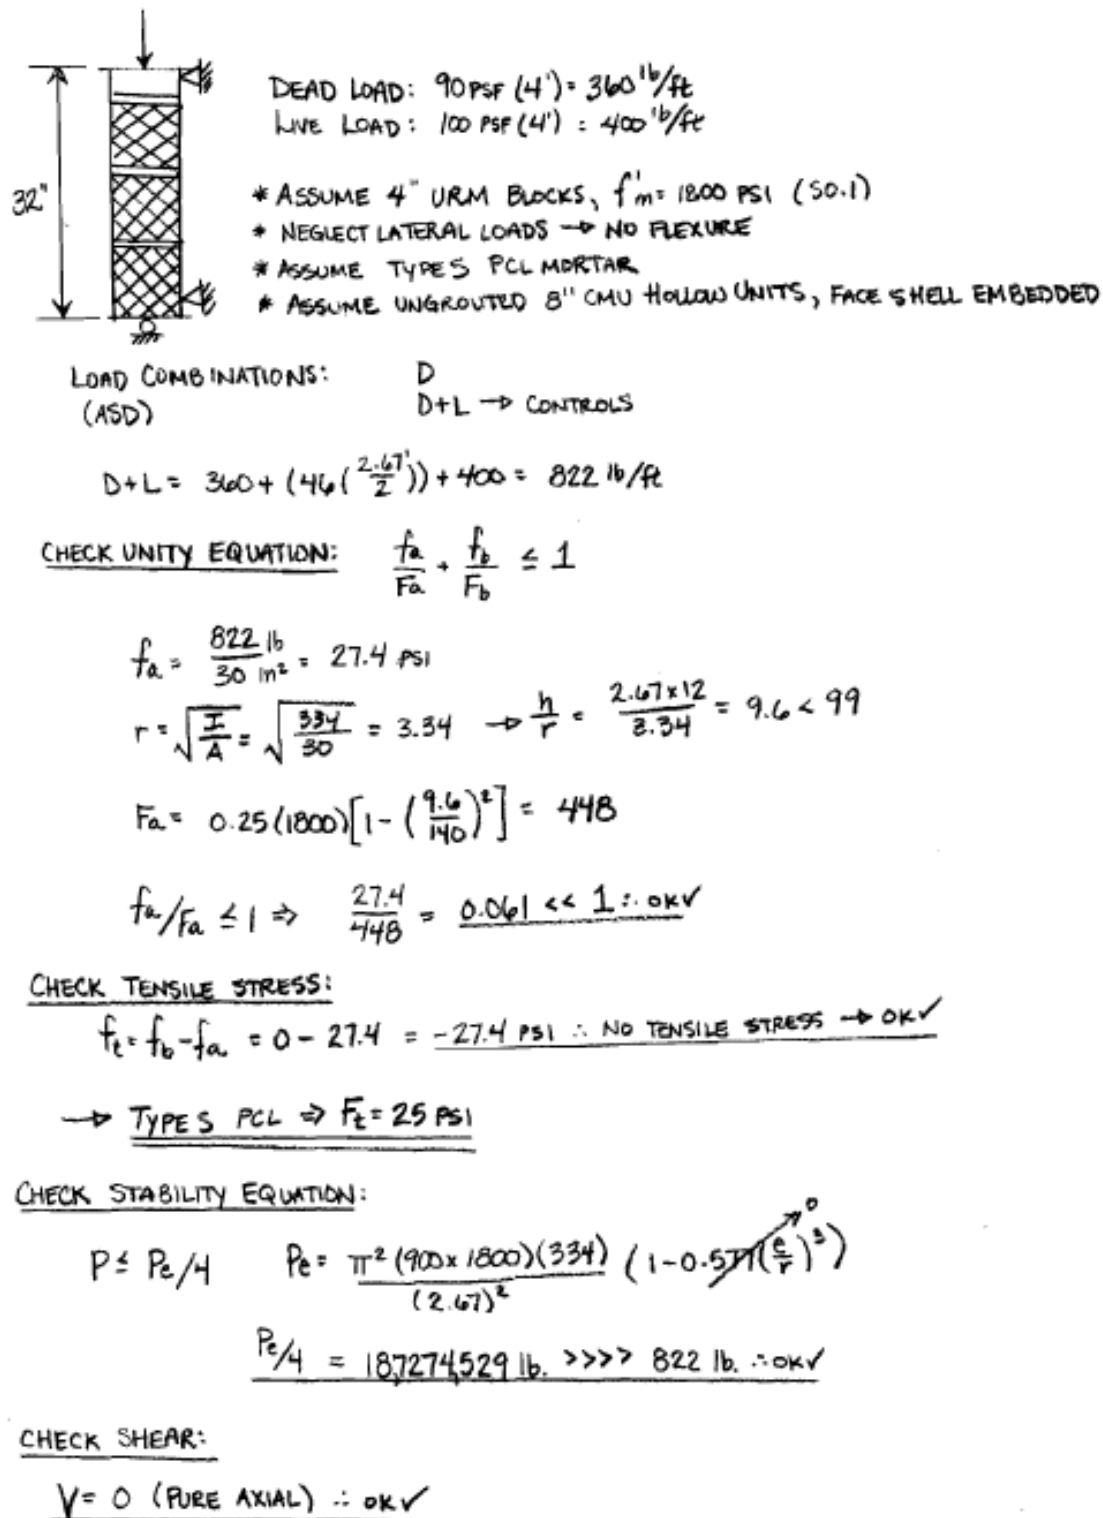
Sample Calculation: Masonry Bearing Wall ASD Design
